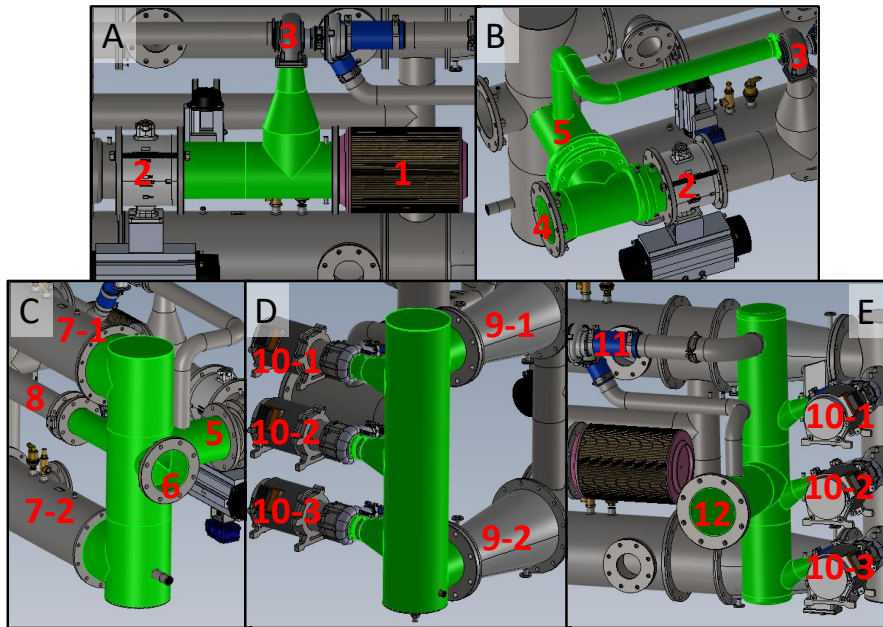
59. MEDAS piping geometries for the pressure drop study: (A) MEDAS intake; (B) Engine intake connection and dilution pipe; (C) Engine exhaust connection and exhaust coolers inlet; (D) Mechanical compressors inlet; (E) Mechanical compressors outlet & MEDAS exhaust. Component identification according to Figure 3. 31
